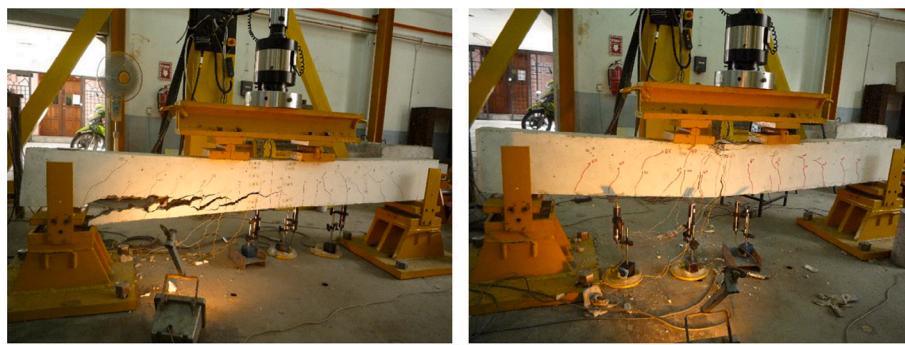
Failure of RC beams strengthened by FRP and steel bars [234].
